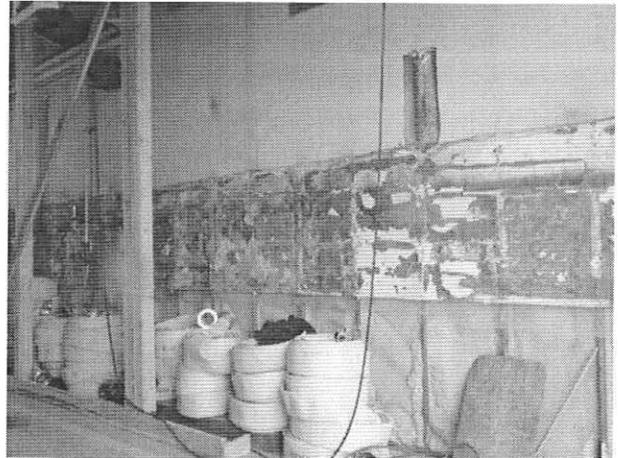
, damaged wall studs at the north end of garage wall.
